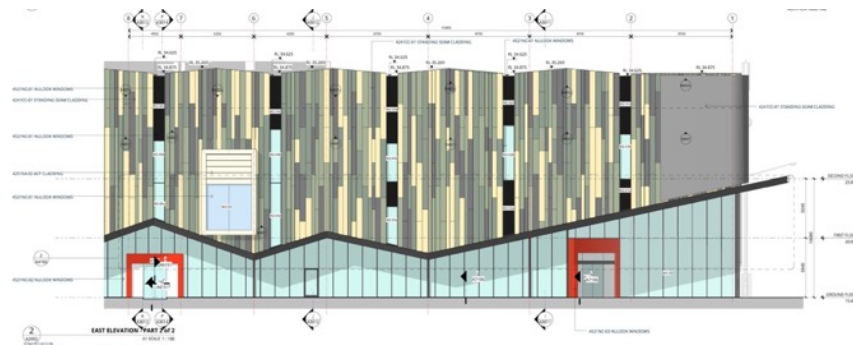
The east elevation, illustrating how the size (height and width), scale and proportions of the sign has been tailored to match as closely as possible the size, scale and proportions of the upper level cladding panels on the elevation.
